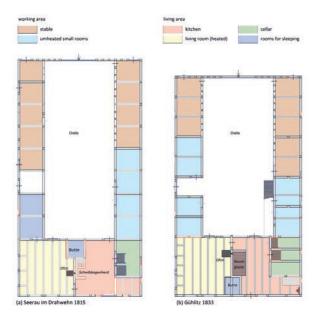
Ground plan of a house without a living room compared to one with a heated living room
